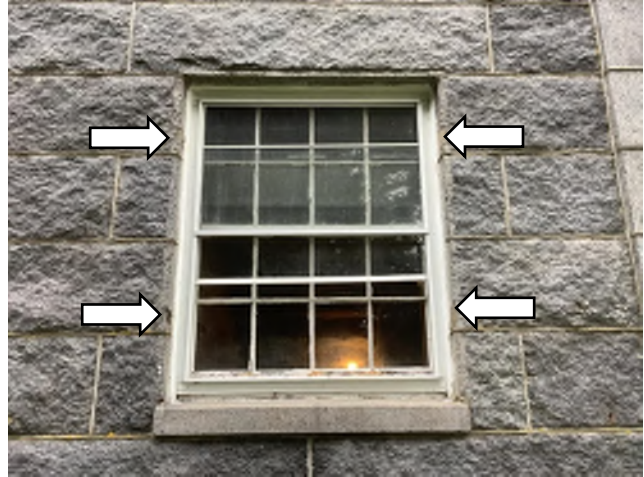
Typical First Floor window at the Original building viewed from the exterior. The arrows indicate apparent locations of a previous security screen or shutter attachment.
